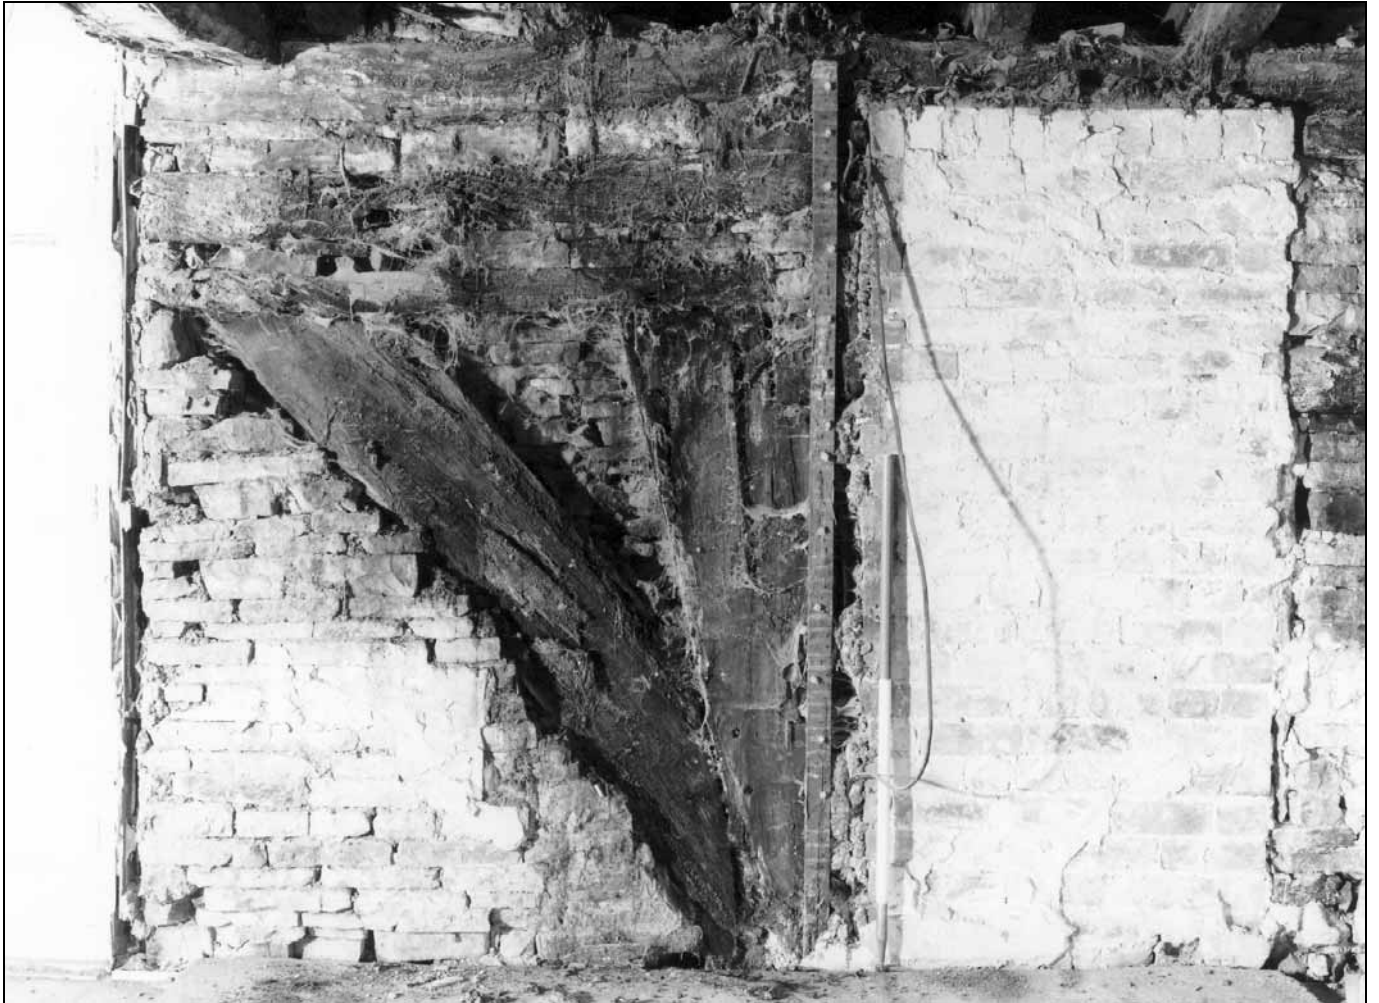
Detail of top of arcade post and arch brace (film 3, frame 8)
